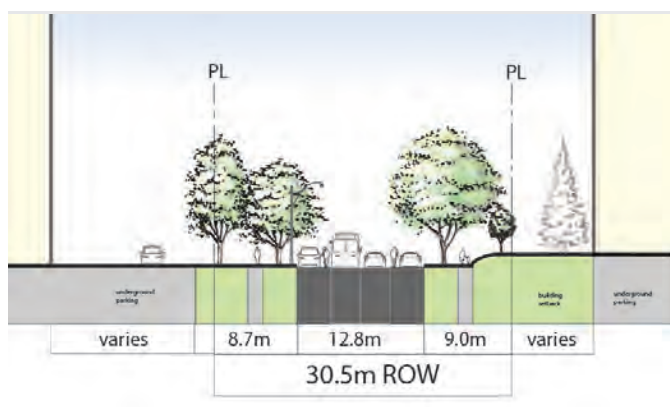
High Park Avenue illustrative street cross-section diagram.
